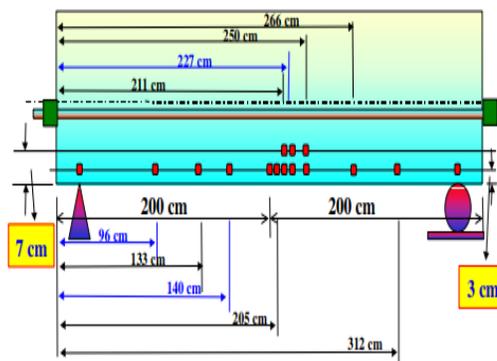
Figure. A schematic diagram of the FBG sensors on the PC beam—surface mounted.
